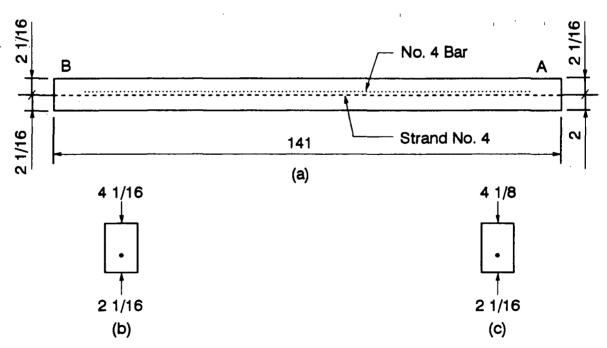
Specimen No. 17-6.0DC-4 (dimensions shown in inches): (a) plan view; (b) end view at B; (c) end view at A
